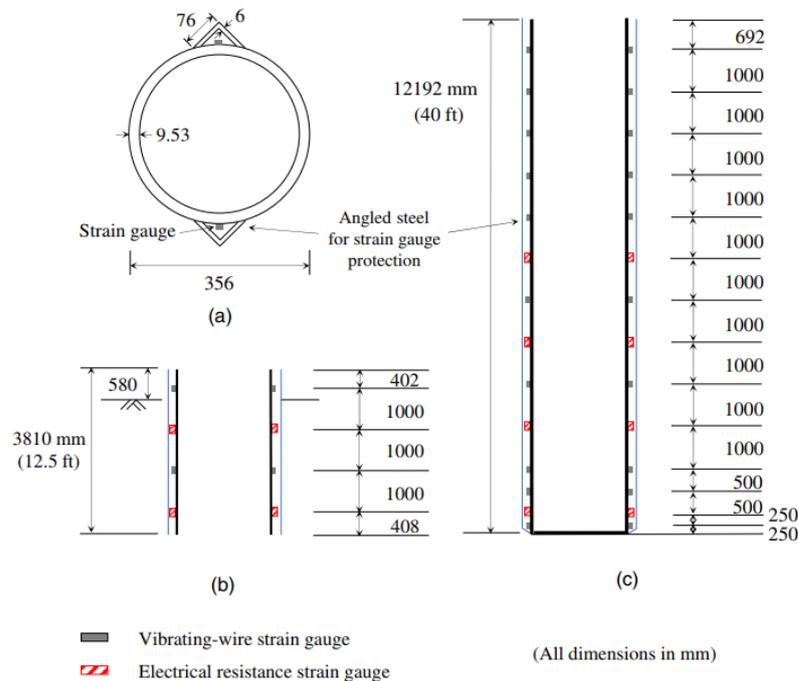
(a) Cross section of instrumented pile, (b) strain gauge positions in top section of instrumented pile and (c) strain gauge positions in bottom section of instrumented pile (Han et al., 2017)
